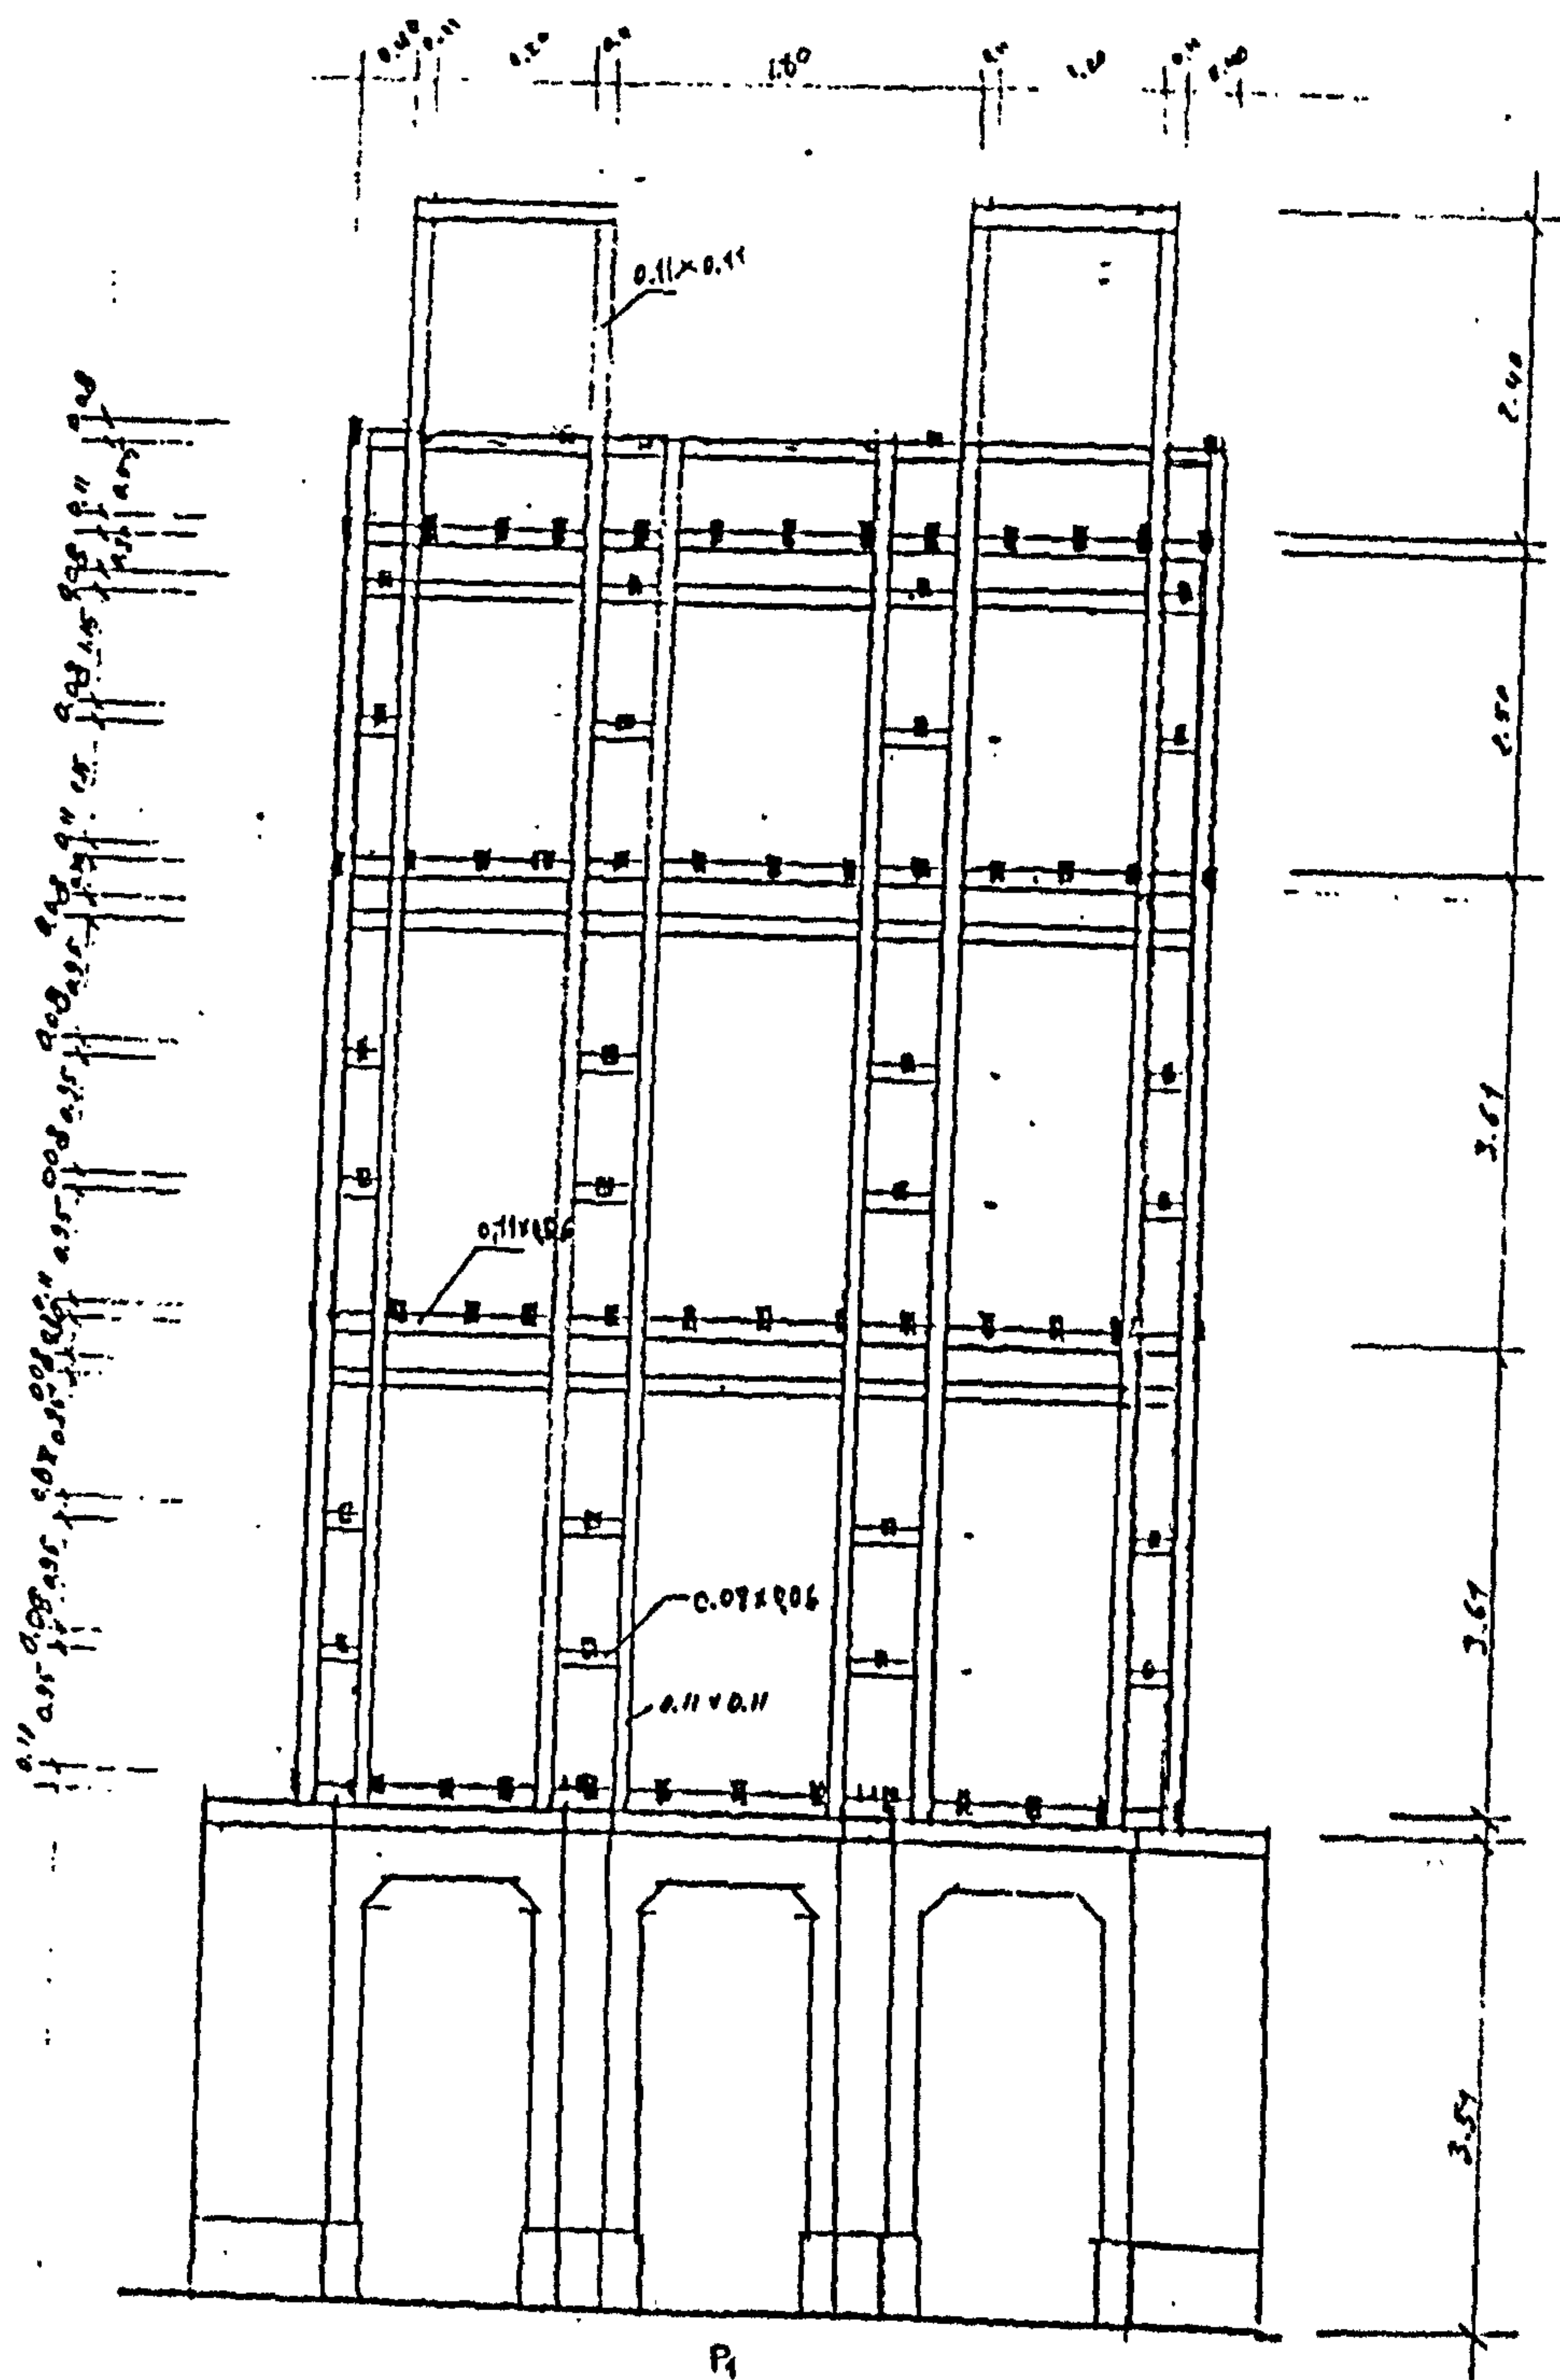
Vertical plane of gaiola, number 1, (façade).
